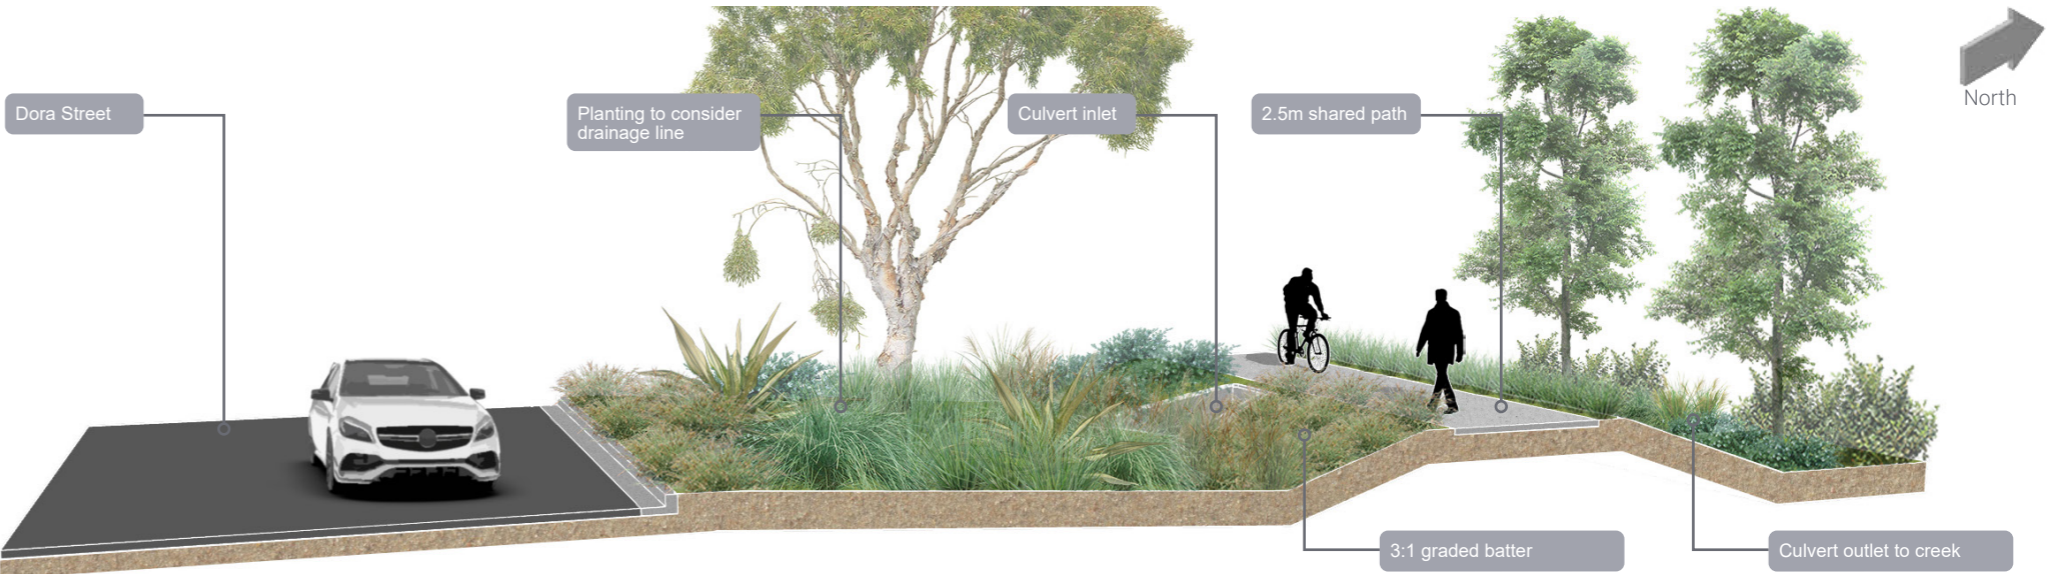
Typical Section C - Shared Path Across Creek Culvert
